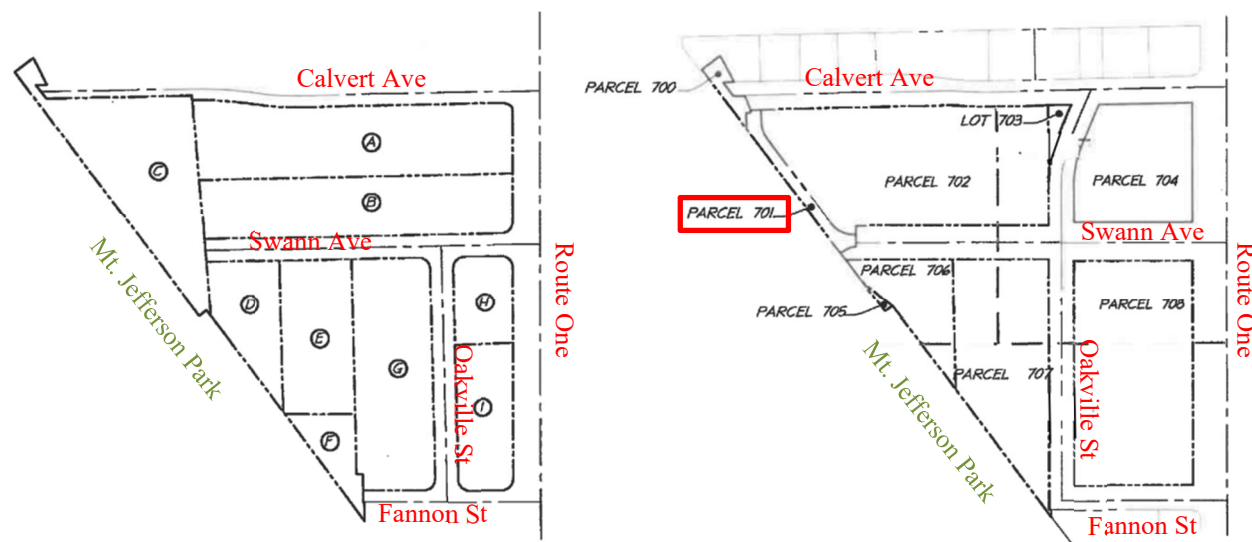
Existing conditions in Oakville Triangle, left. Approved subdivision with new parcels and street network, right. Proposed new private road seen as Parcel 701.
